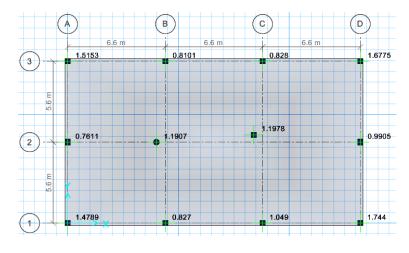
Along shorter side reinforcement(SAFE:IS, without staggered column)
